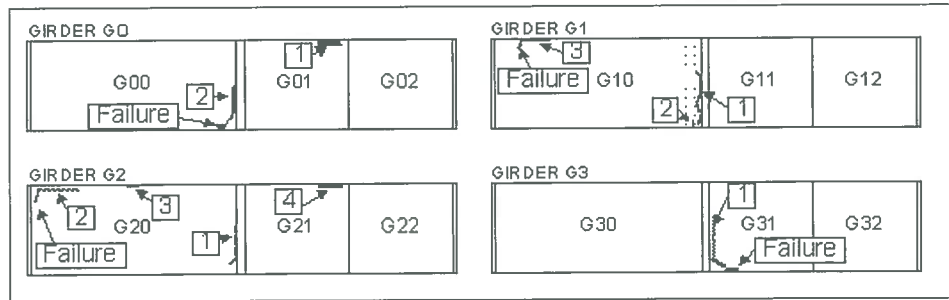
Crack scenario observed in the tested girders after failure (after *Journal of Constructional Steel Research*).
